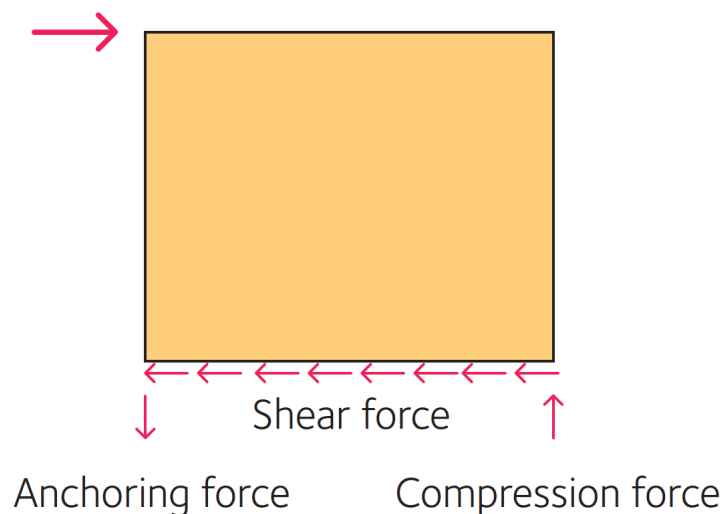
Horizontally loaded CLT wall (Swedish Wood, 2017).
